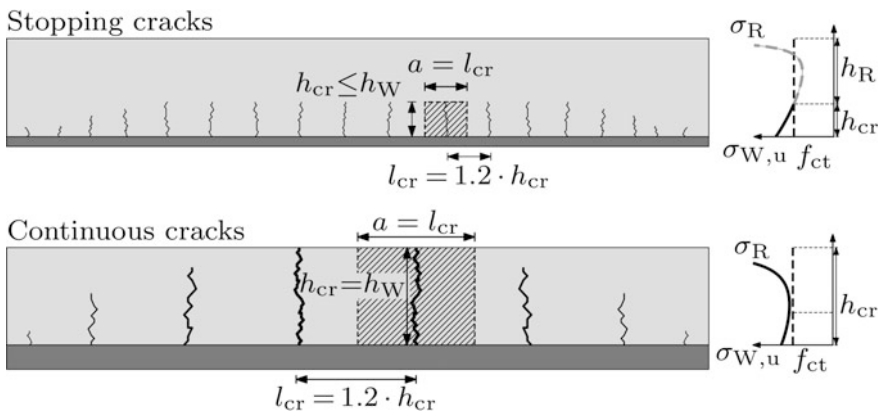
Conceptual model to determine the distance between primary cracks in walls restrained by a foundation depending on the crack height (Schlicke 2014)
